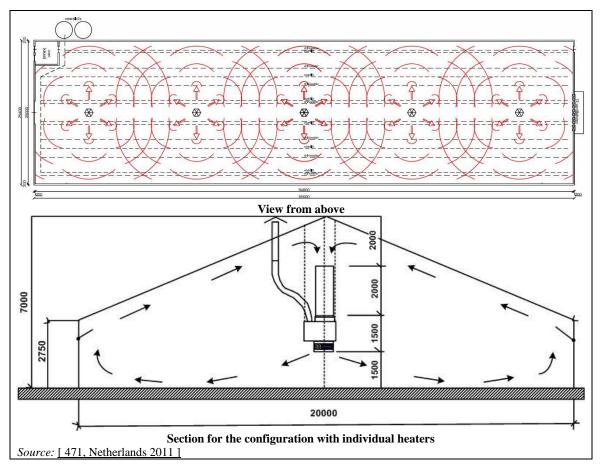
Plan and cross section of horizontal ventilation with air recirculated by indoor fans
